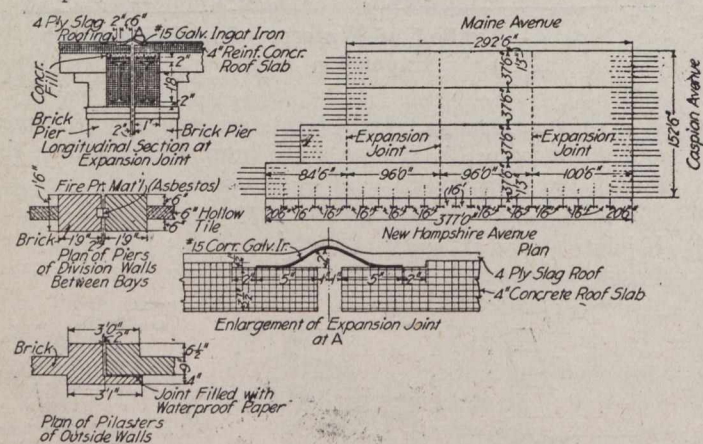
Design of Expansion Joint in Car House at Atlantic City.
